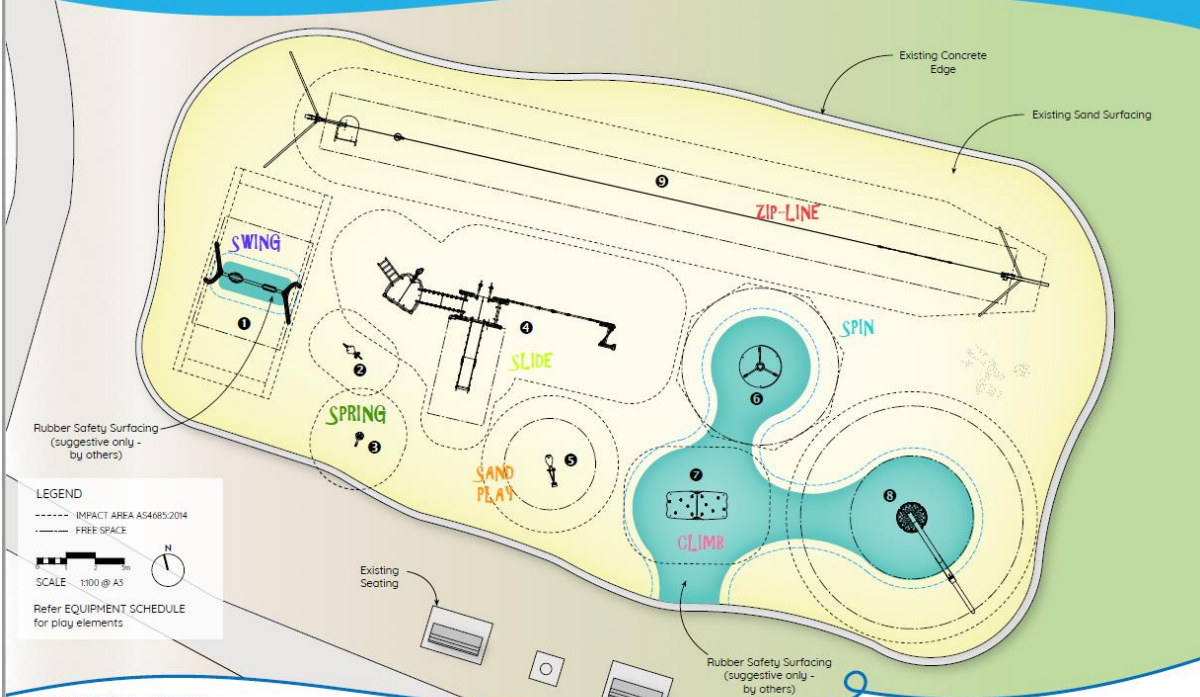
102 | EQUIPMENT SCHEDULE
